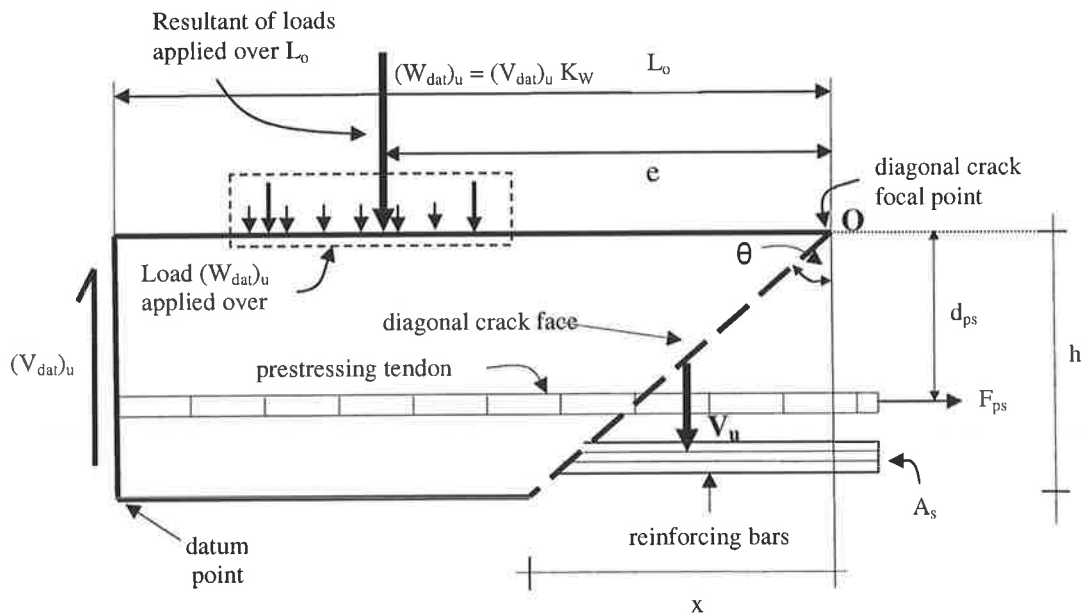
Vertical loads to cause crack sliding at failure
